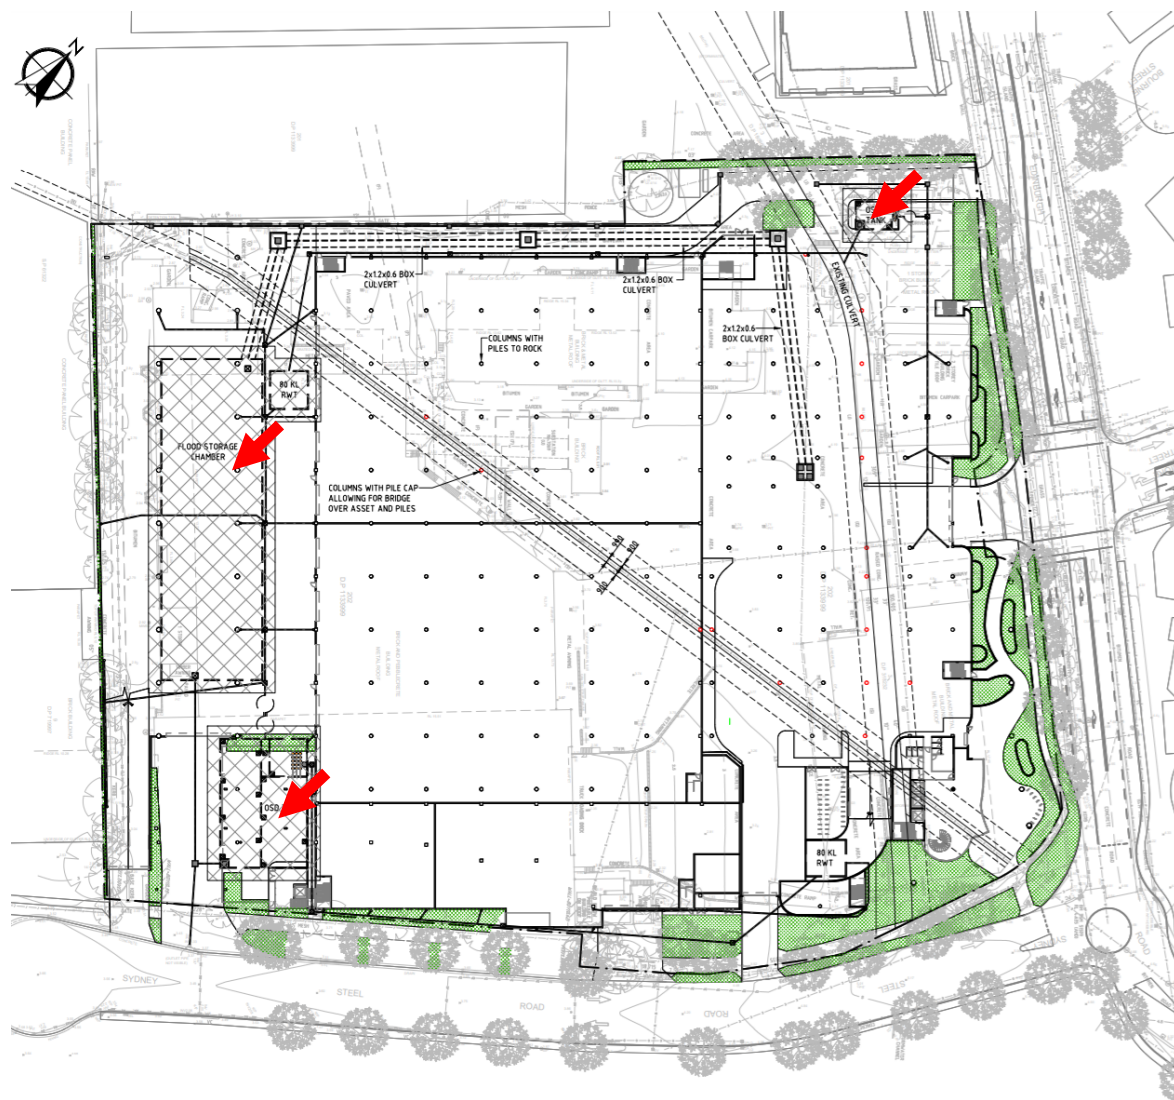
Excavation extent plan. Note the proposed bulk excavation areas marked by the red arrows.
